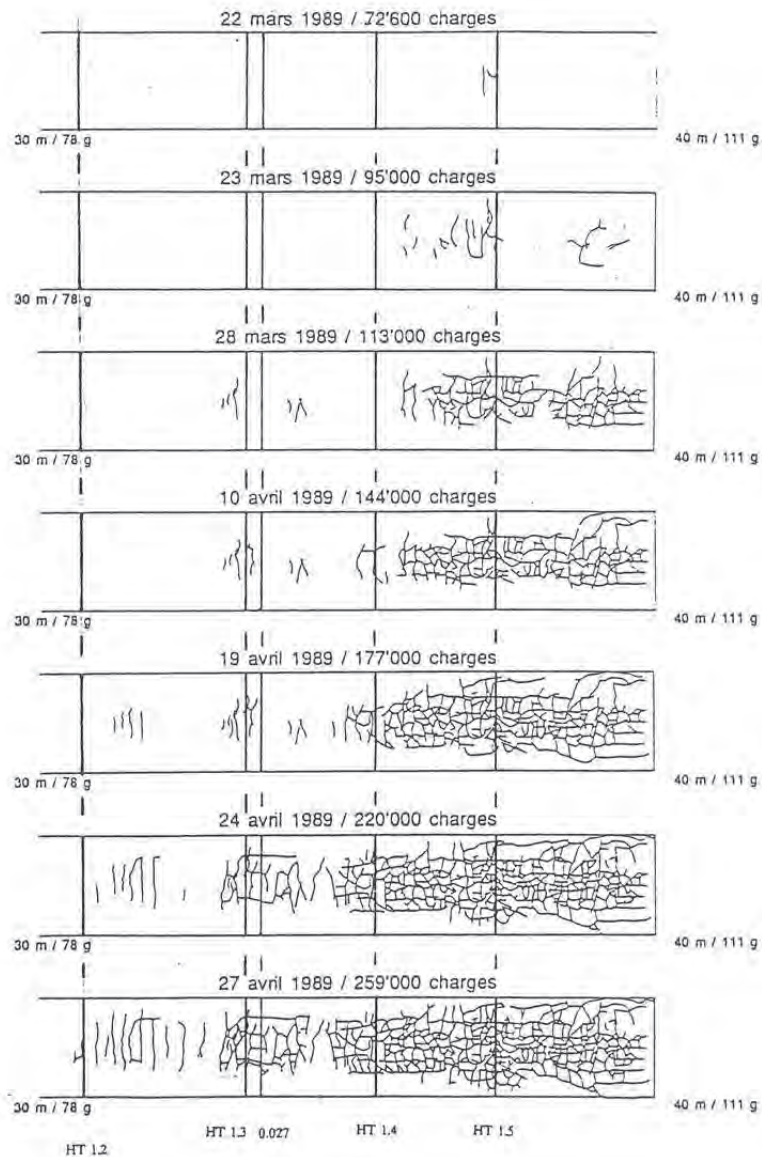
(b) Cracking pattern of section 01 from 30 to 40m
